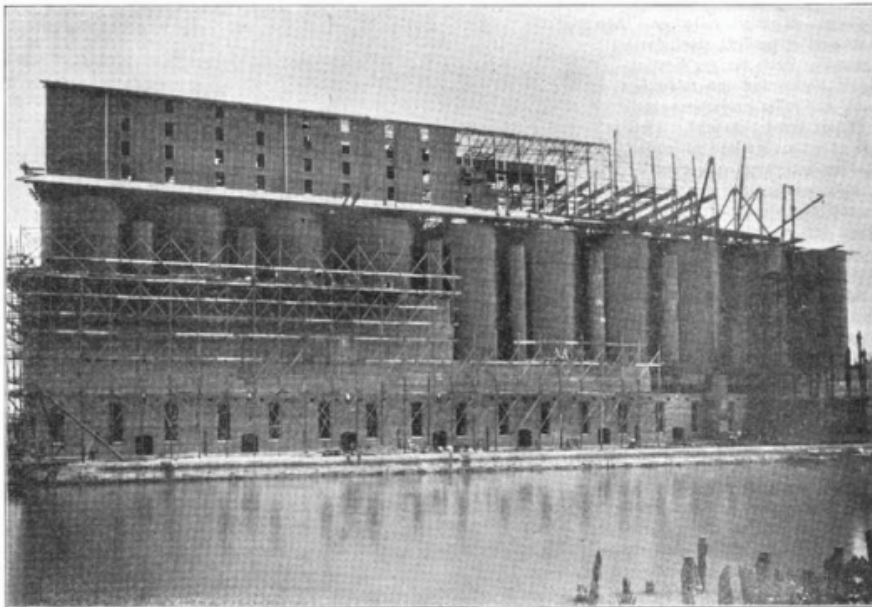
From “Fireproof Steel and Brick Grain Elevator,” *Scientific American* 77. 26
